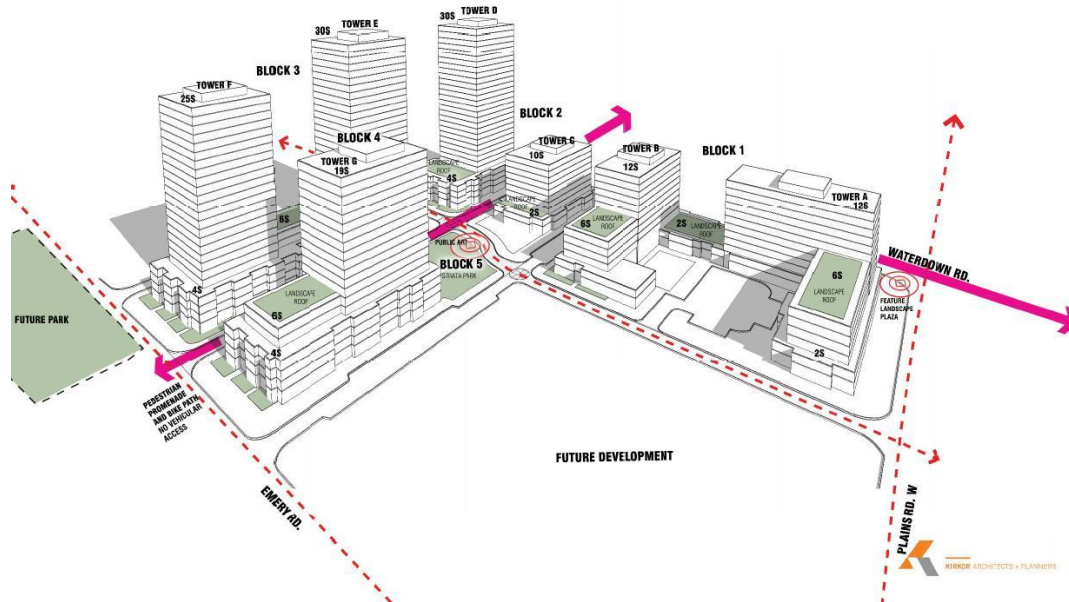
Emshih Conceptual Vision (looking northeast from Plains Road West)
